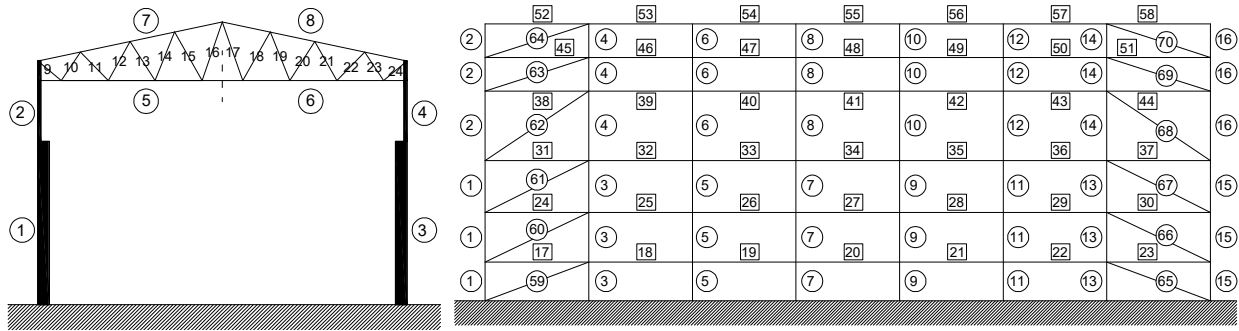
Frame 14: a) main trussed frame, b) CB frame.
